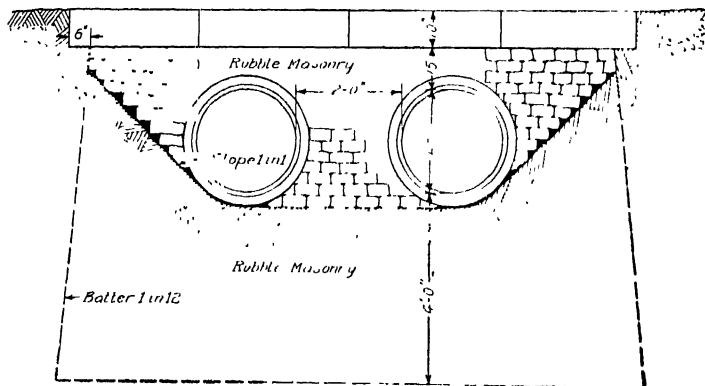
Section Showing Typical Layout for Double Pipe Culvert
